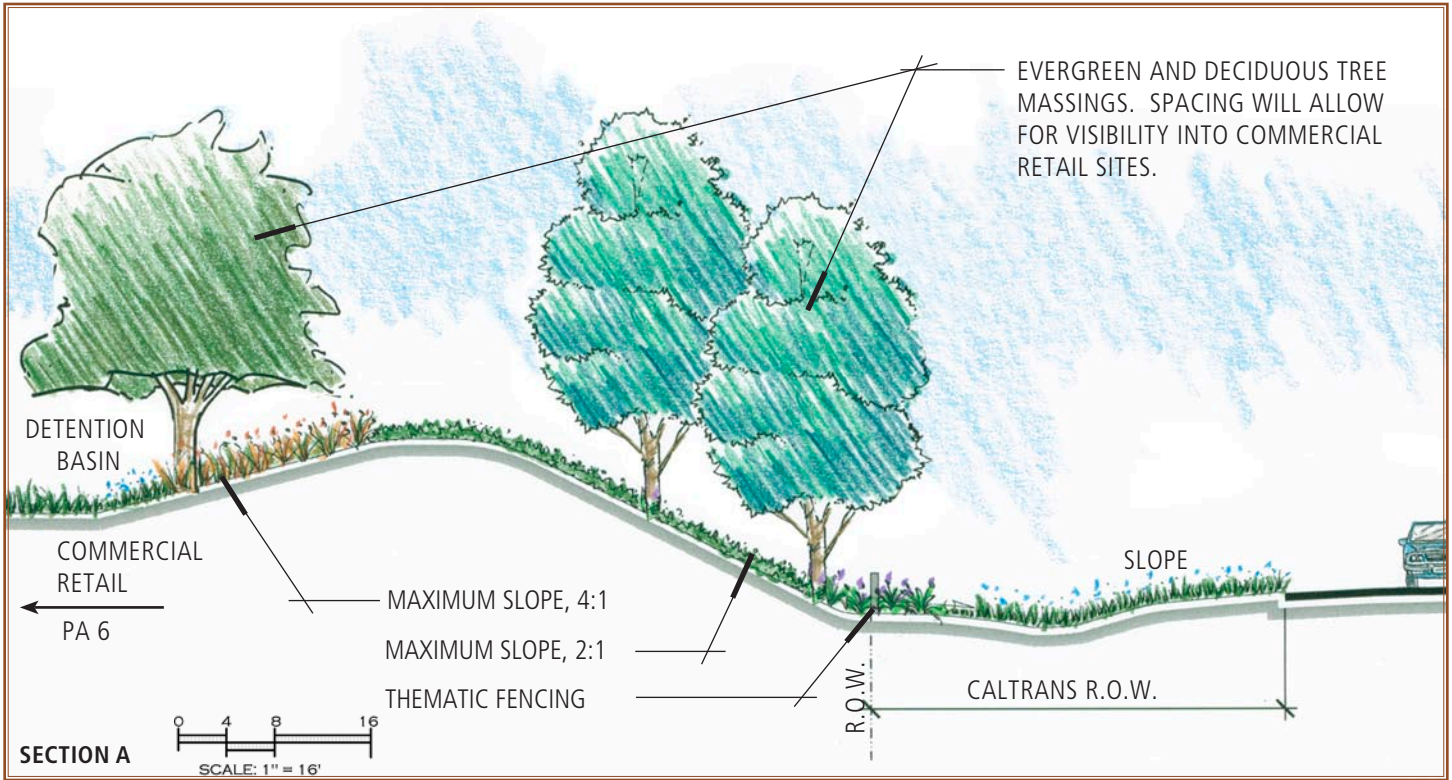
B: Highway 79 / Winchester Road Streetscape - Elevations
